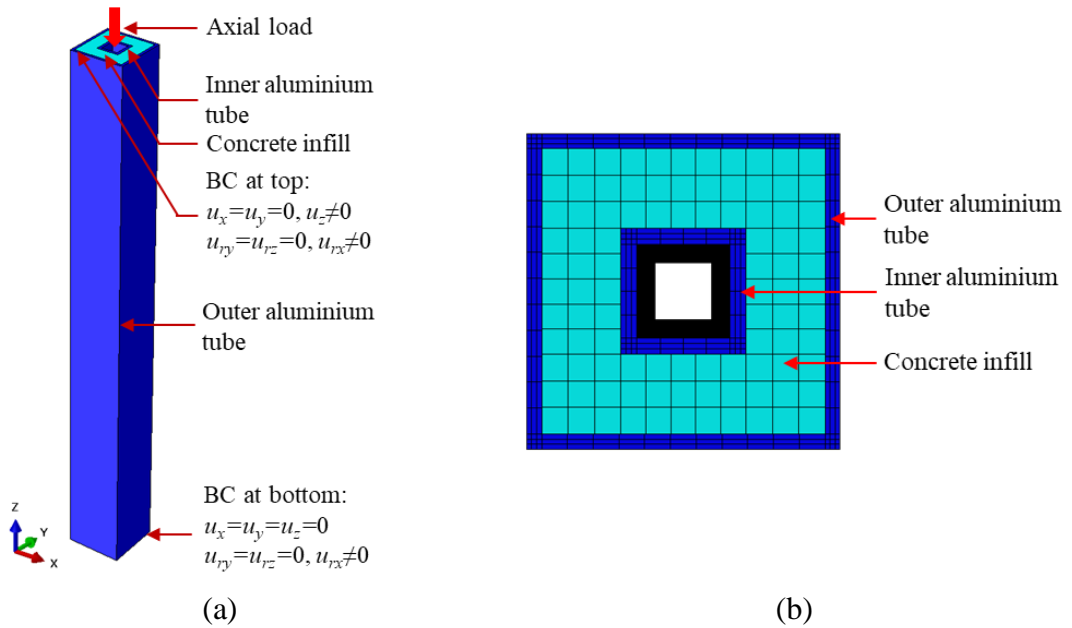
FE model of a typical CFDSAT specimen: (a) loading direction and boundary conditions, (b) cross-section.
